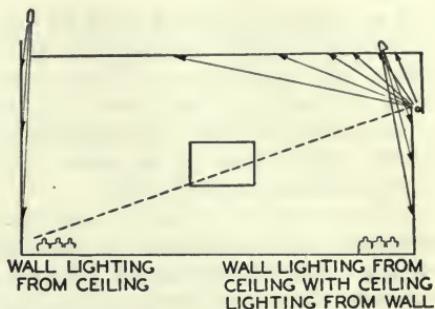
Wall and ceiling lighting methods for desired surround illumination.
